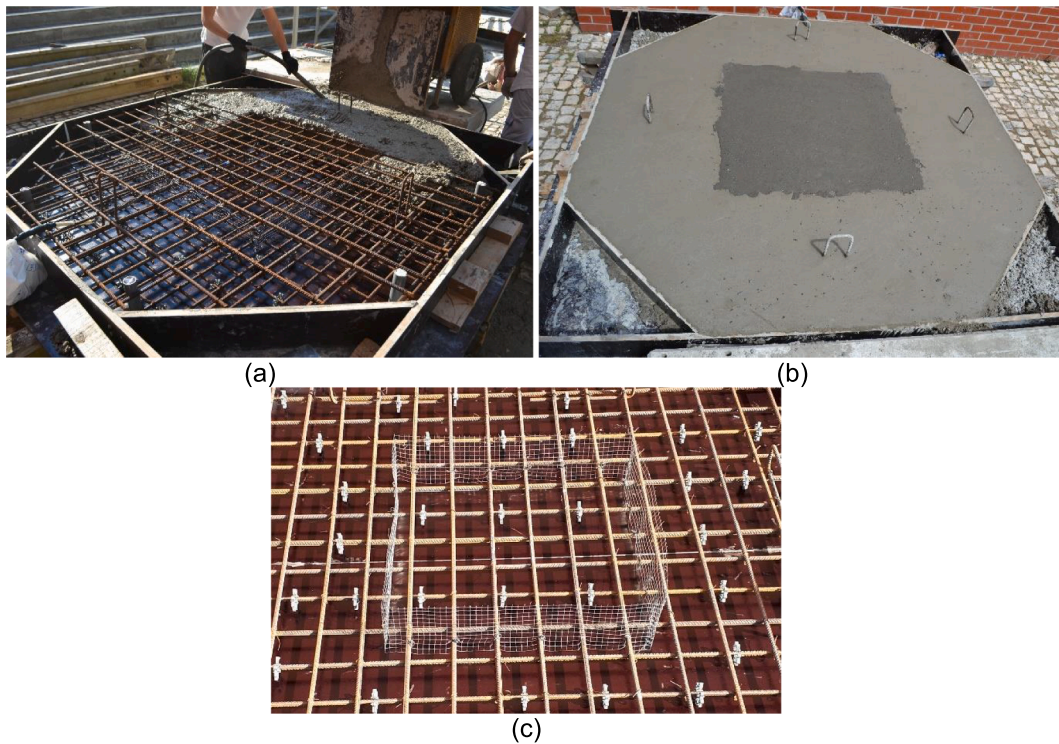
Casting of specimens: a) formwork; b) finished product; c) steel net.
